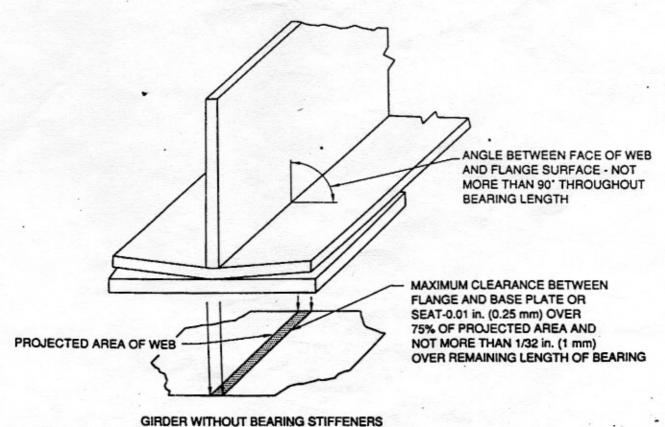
Tolerances at Bearing Points cl. 5.2.5
